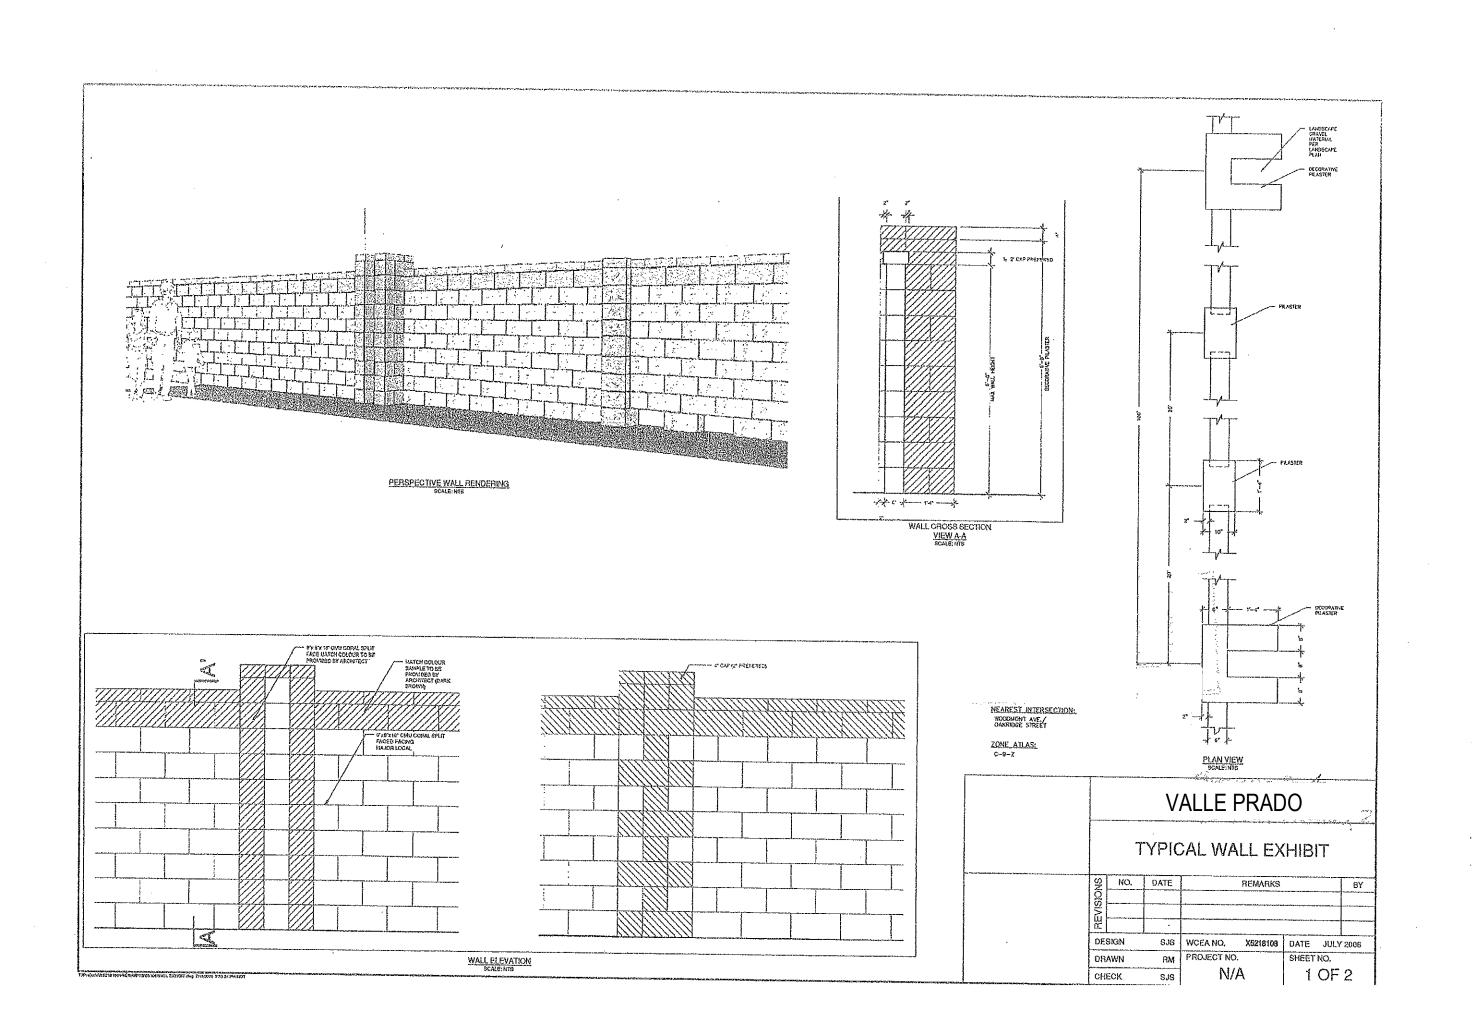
EXHIBIT "E" VALLE PRADO UNIT 3 WALL EXHIBIT 10/24/2014
